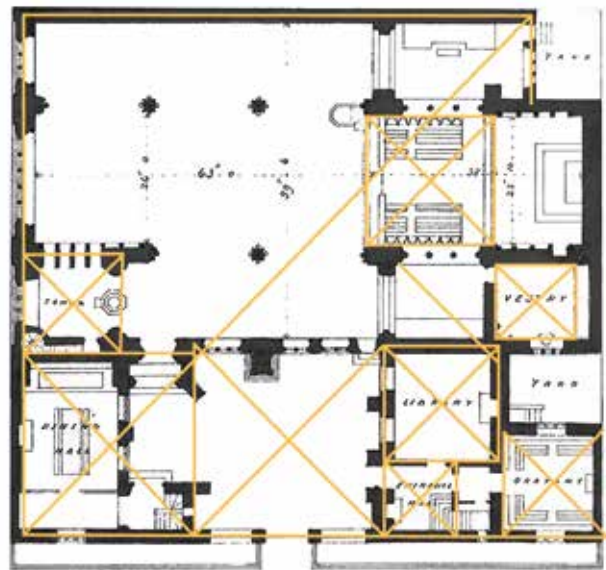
William Butterfield's 1849 plan of All Saints, Margaret Street, London
